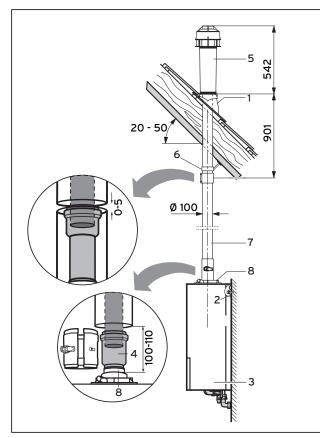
Fitting the appliance and the vertical roof duct to a building with a pitched roof
